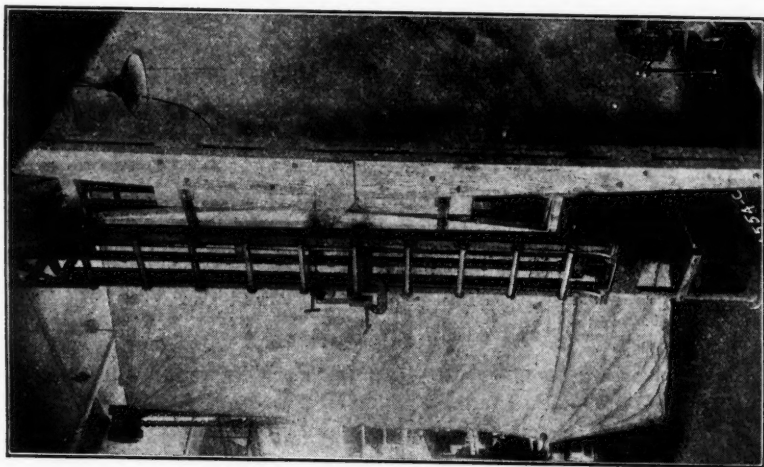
VERTICAL JIG FOR TESTING STRUTS.
